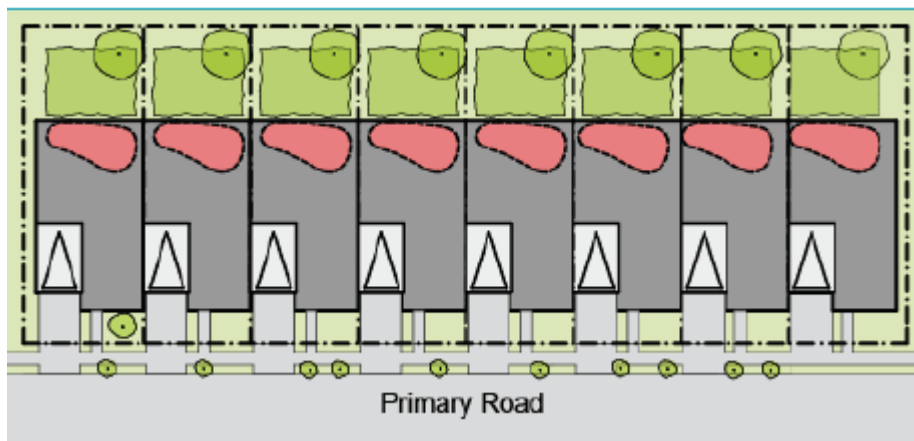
Proposed layout for terrace development: Each dwelling may have a garage and primary road access
